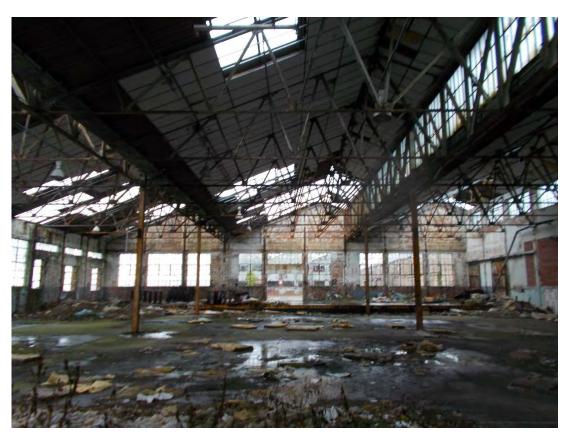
View of the interior of the former Assembly Shop, looking NW.
